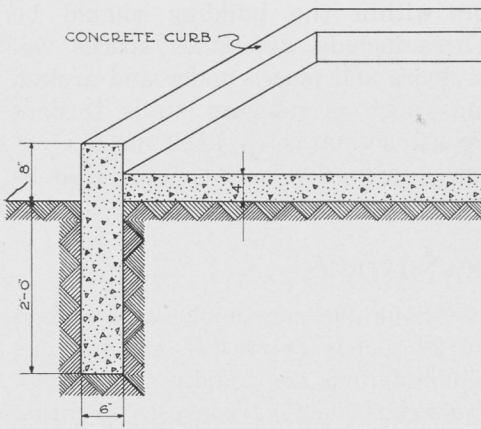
A concrete apron and continuous footing is essential for feeding floors to keep the rats from burrowing and the hogs from rooting under the floor. Reinforcing in the floor in the form of heavy wire mesh or woven wire fence will keep cracks in floor from developing.
